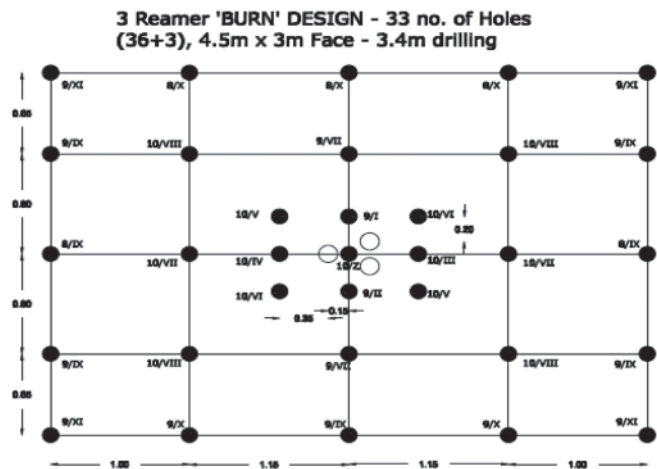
The details of 3 reamer burn design with stemming, explosive and detonators
